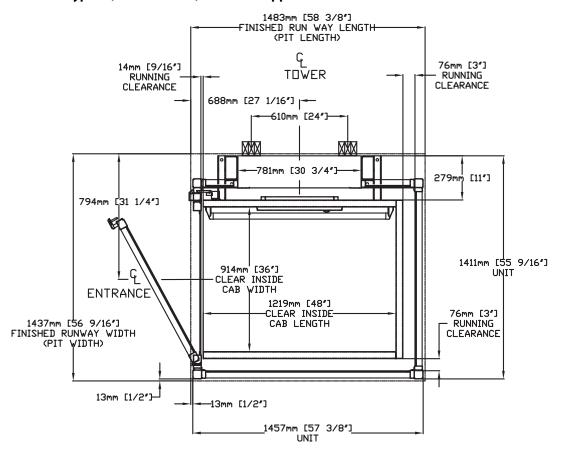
Plan View - Type 1L, 36" x 54" Cab, Hoistway Application
